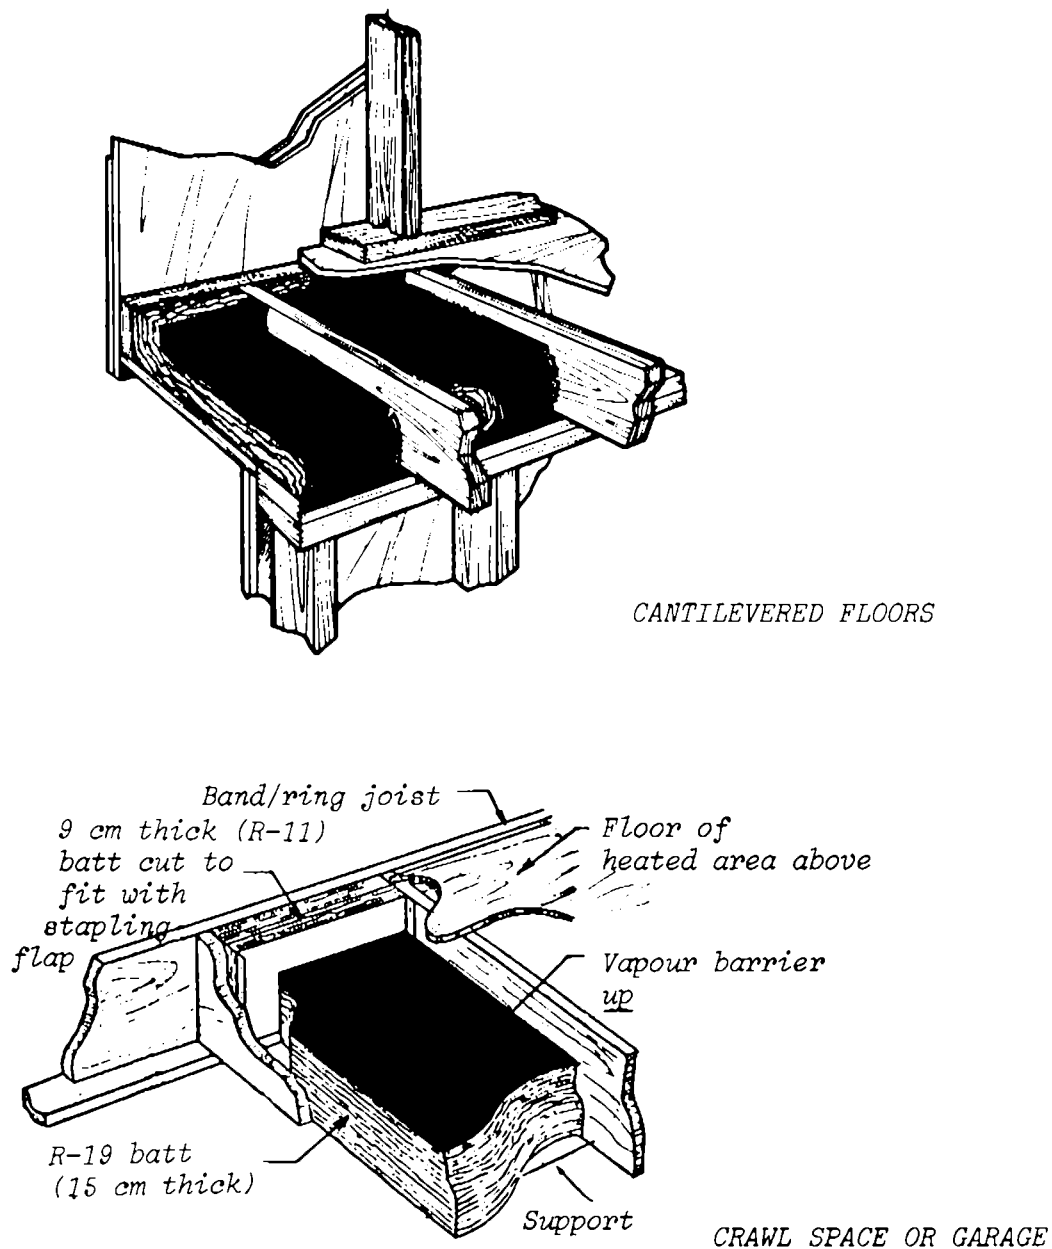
Treatment of the band joist with a specially cut batt and vapour barrier backing including floor insulation above an unheated area with vapour barrier to reduce air infiltration.
